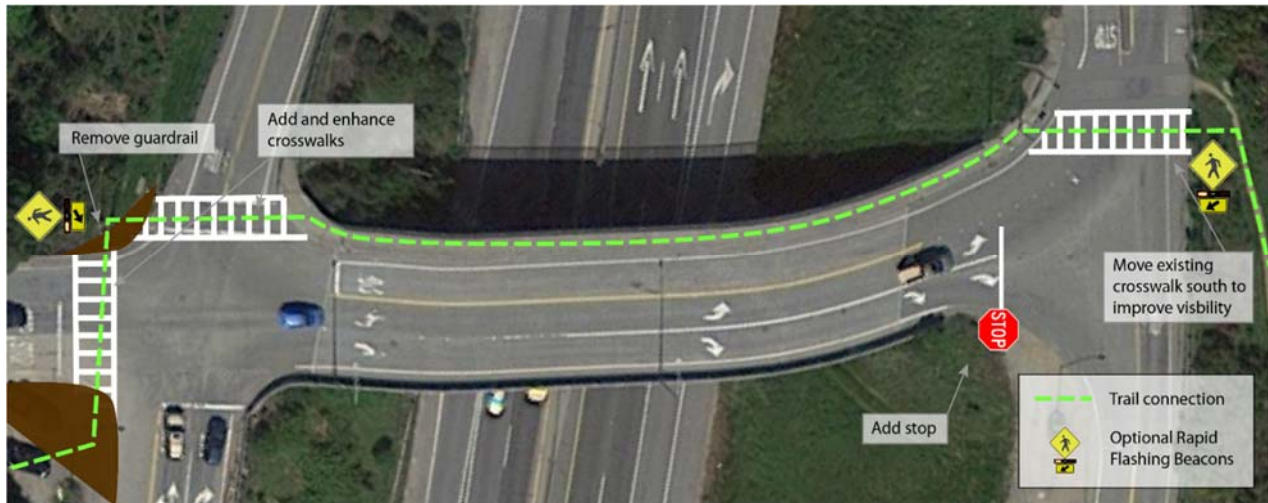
Potential Trail Crossing Improvements to the Bear Creek Road Overcrossing
